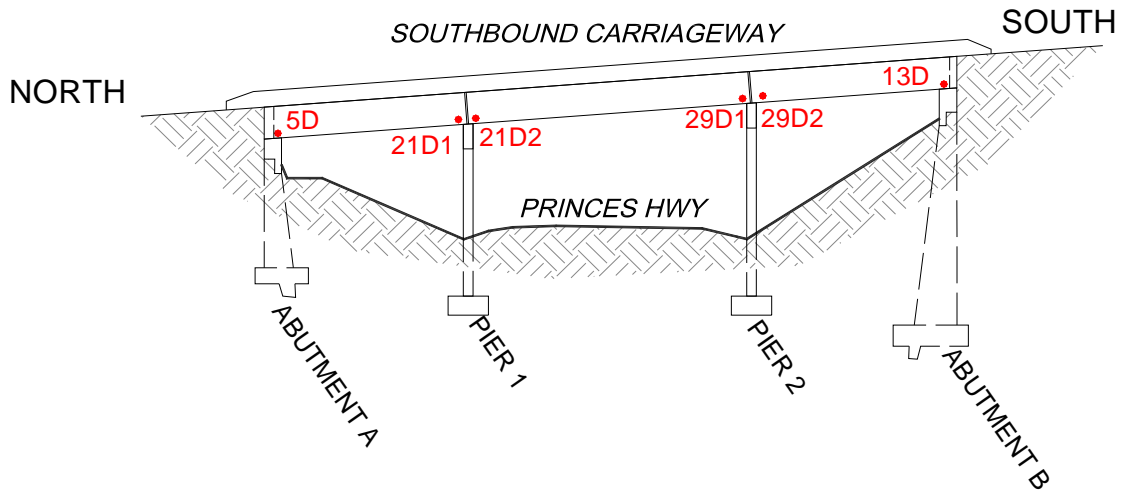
Bridge 2 - Deck Girders – Elevation 3 – Relative 3D Monitoring Locations
